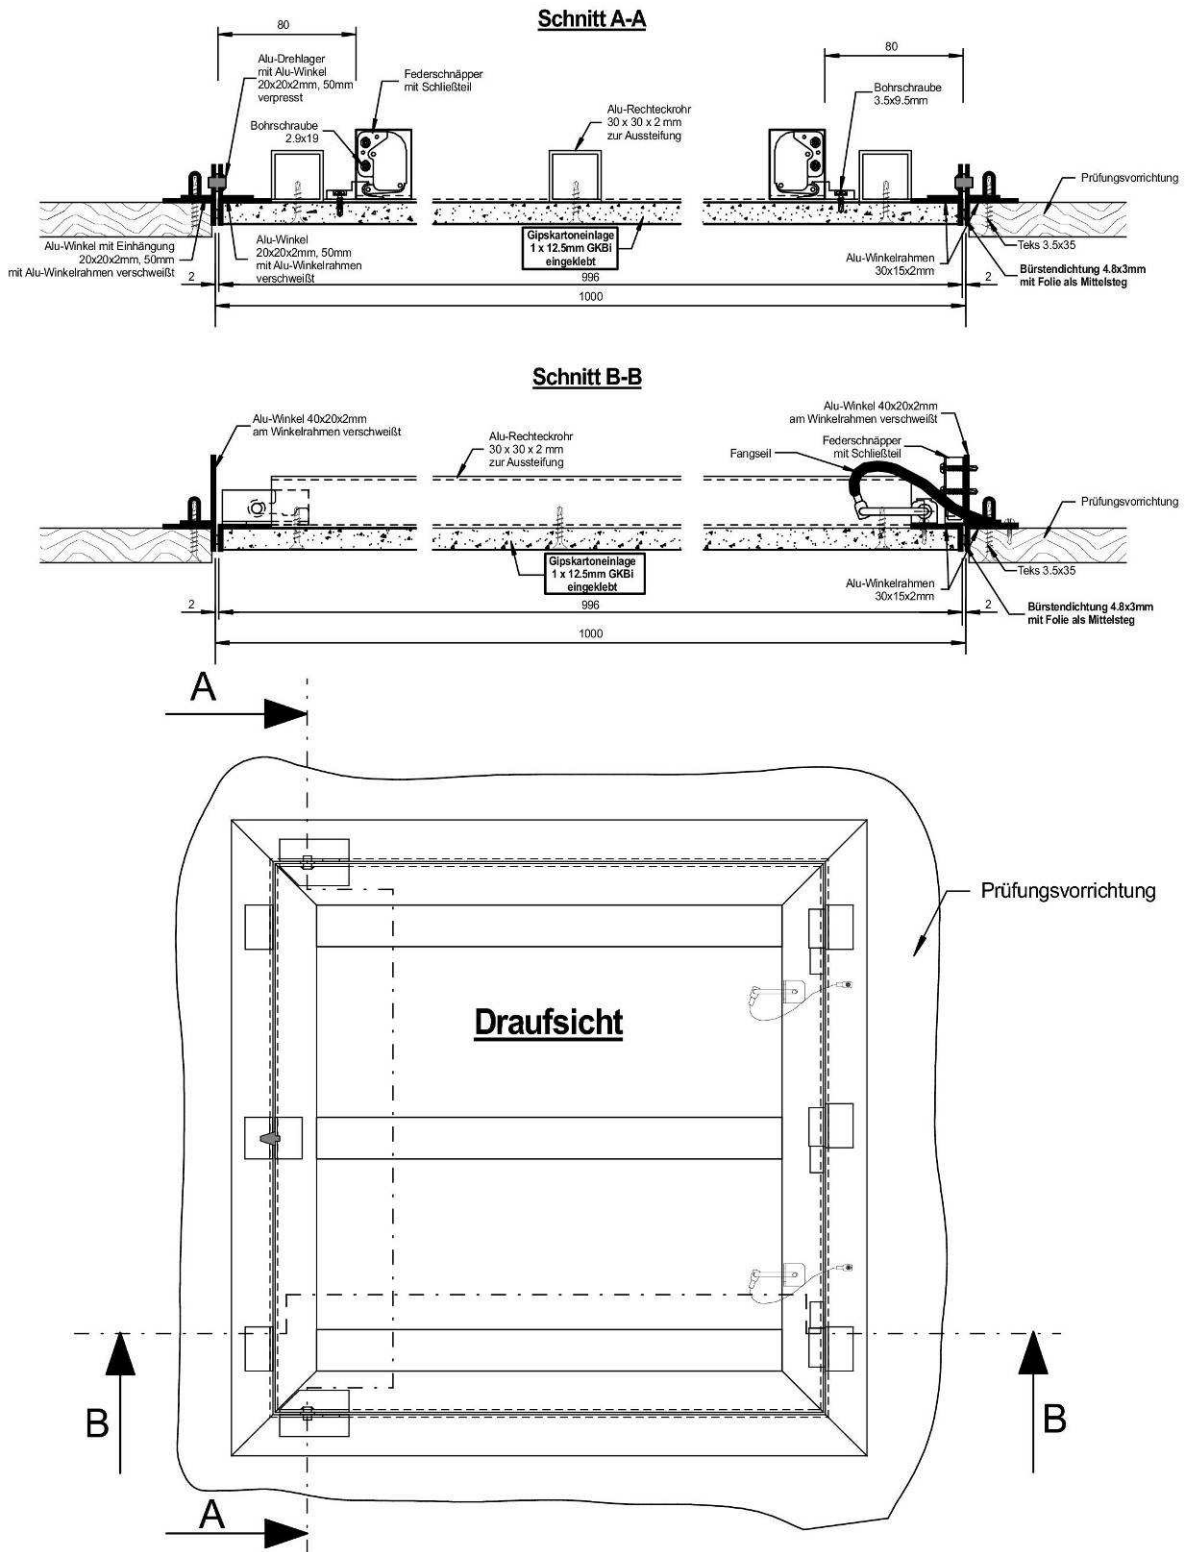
Drawing - referring to test specimen 2 (panel with 12.5 mm GKBI and aluminium reinforcements)
